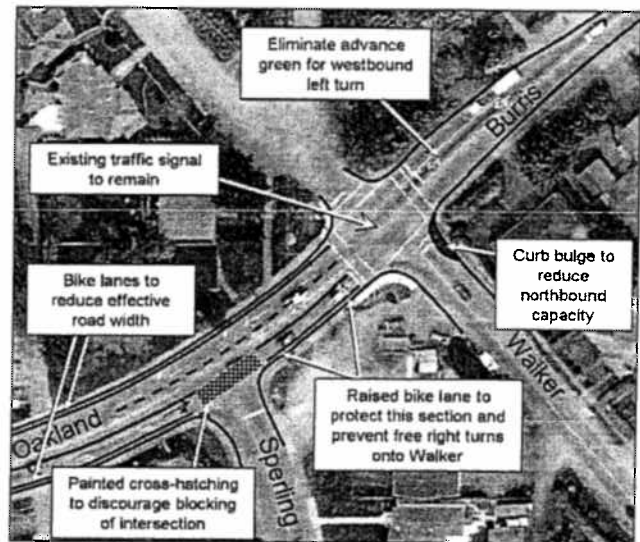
Oakland / Burris / Sperling / Walker Intersection Proposals
